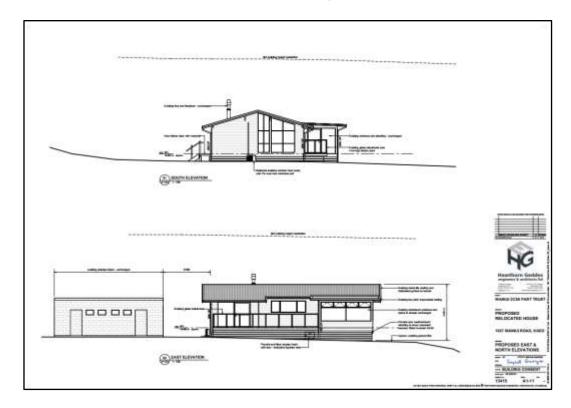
External elevations (Sheet A1-11) (Source: Hawthorn Geddes).
